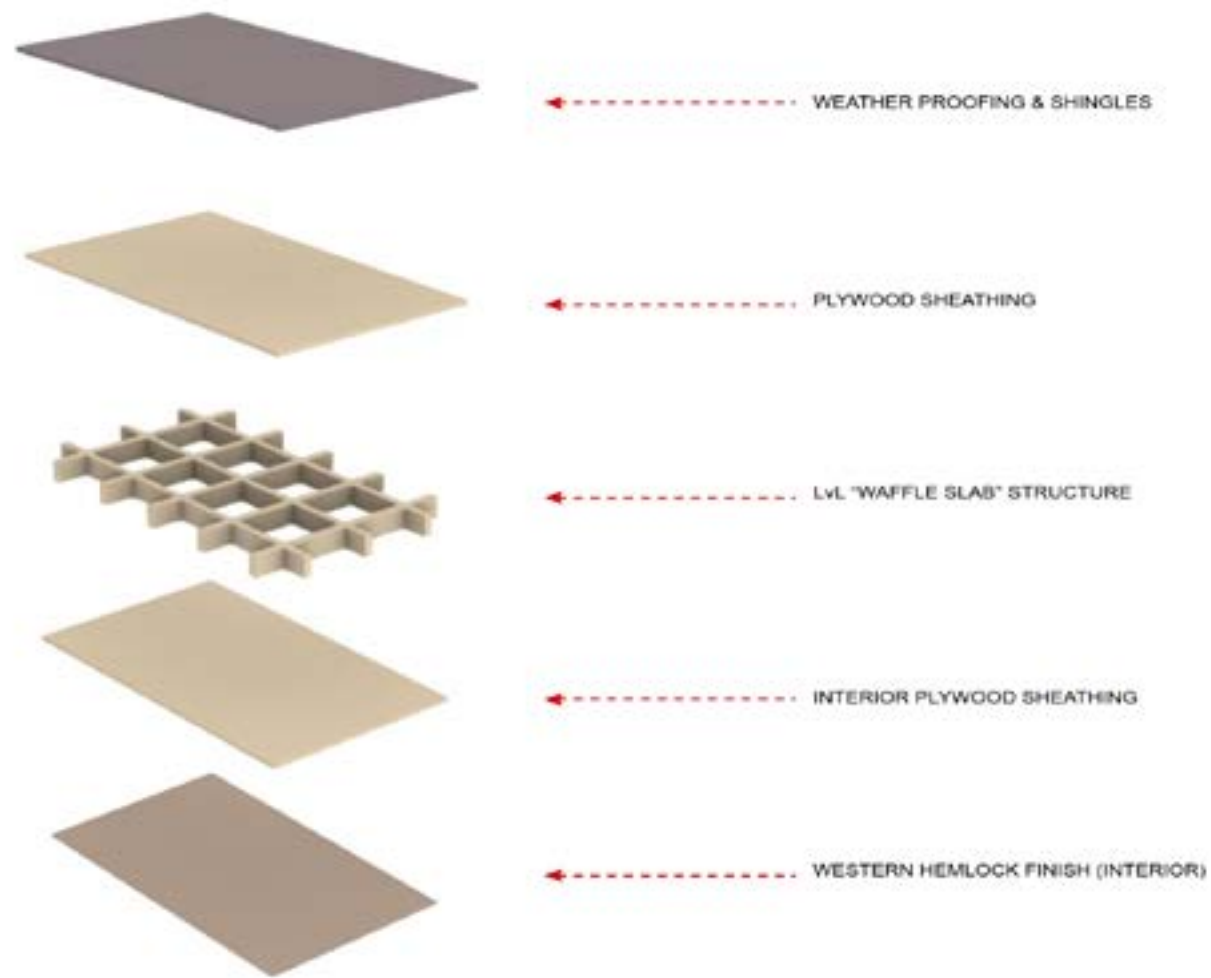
Roof Assembly of an interlocking LVL Mullion system with Western Hemlock interior finish to test thermal qualities; Exploded Axon.
